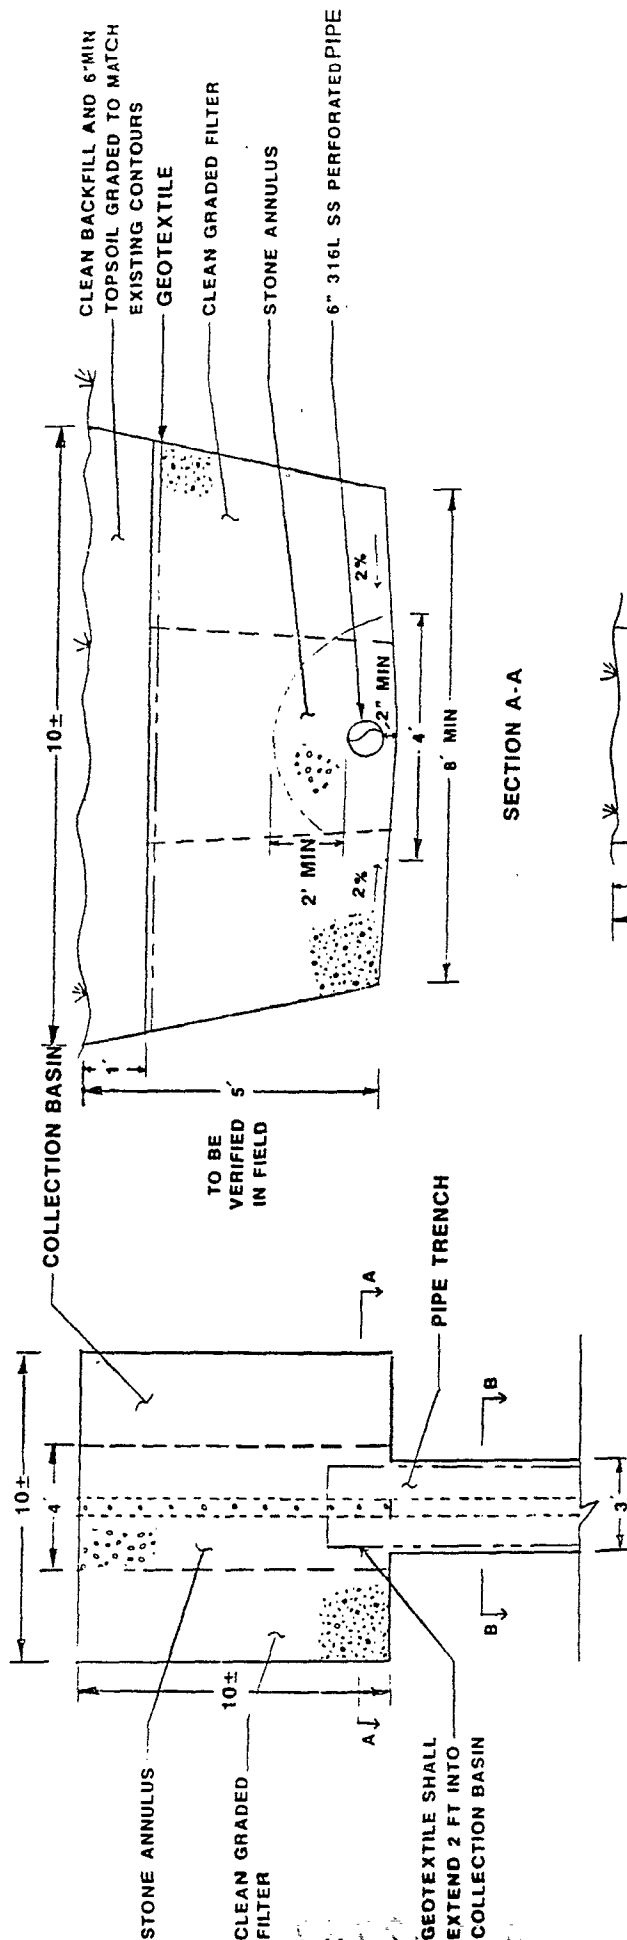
Cross Section of Interception Trench Manhole and Outfall Pipe Design, PCCO Basin Landfill (From Weston, 1983)
